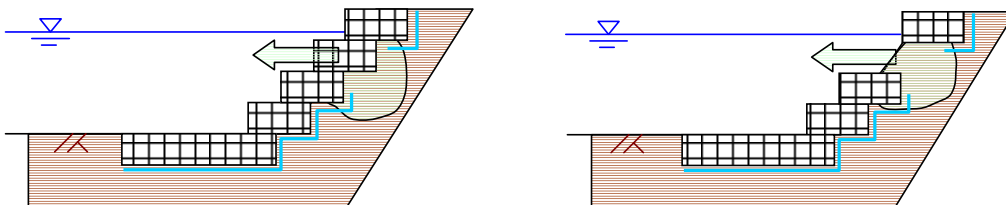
An image of washing away of backfill material: riverbank protection works
